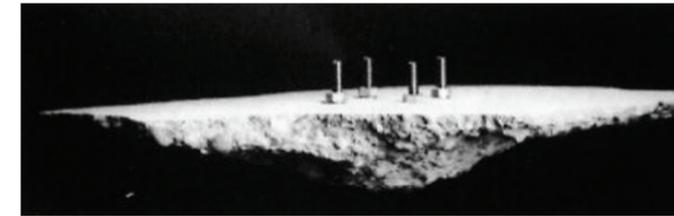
Concrete cone breakout of a group of anchors. (Picture from Anchorage in Concrete Construction, R. Eligehausen).
